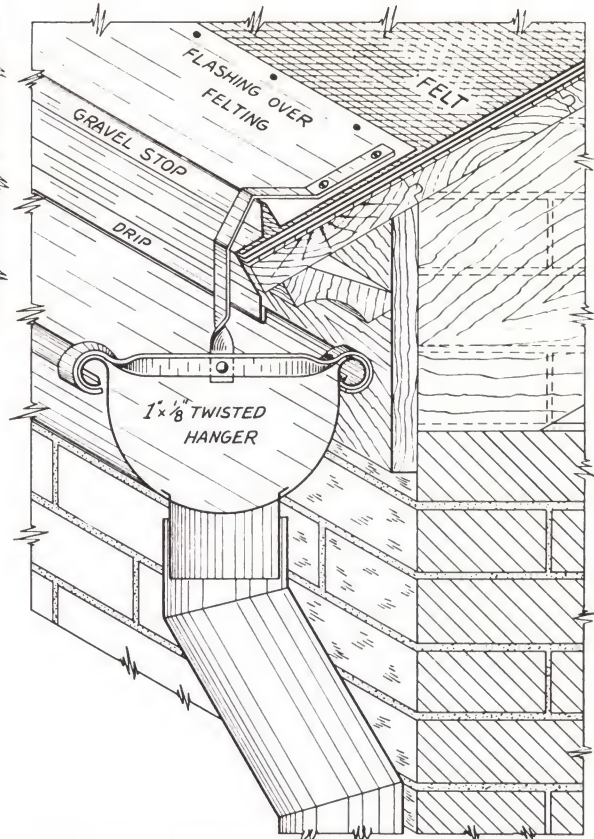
DOUBLE BEAD EAVE TROUGH WITH TWISTED HANGER FOR COMPOSITION AND FLAT TILE ROOF INSTALLATION
